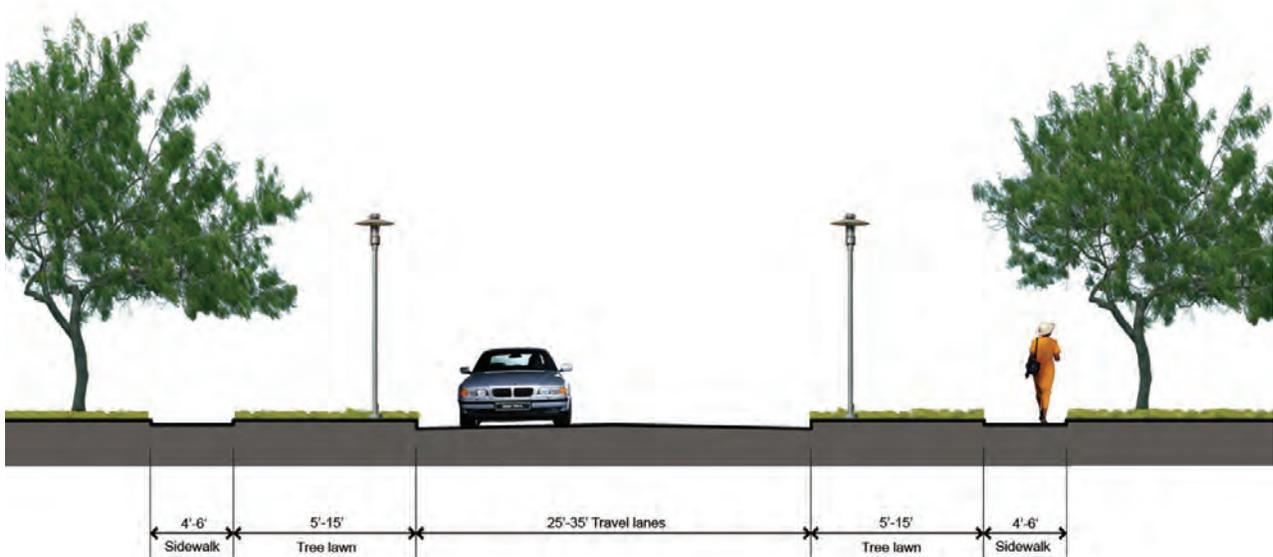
Proposed Cross-Section for a Secondary Route at the Installation
